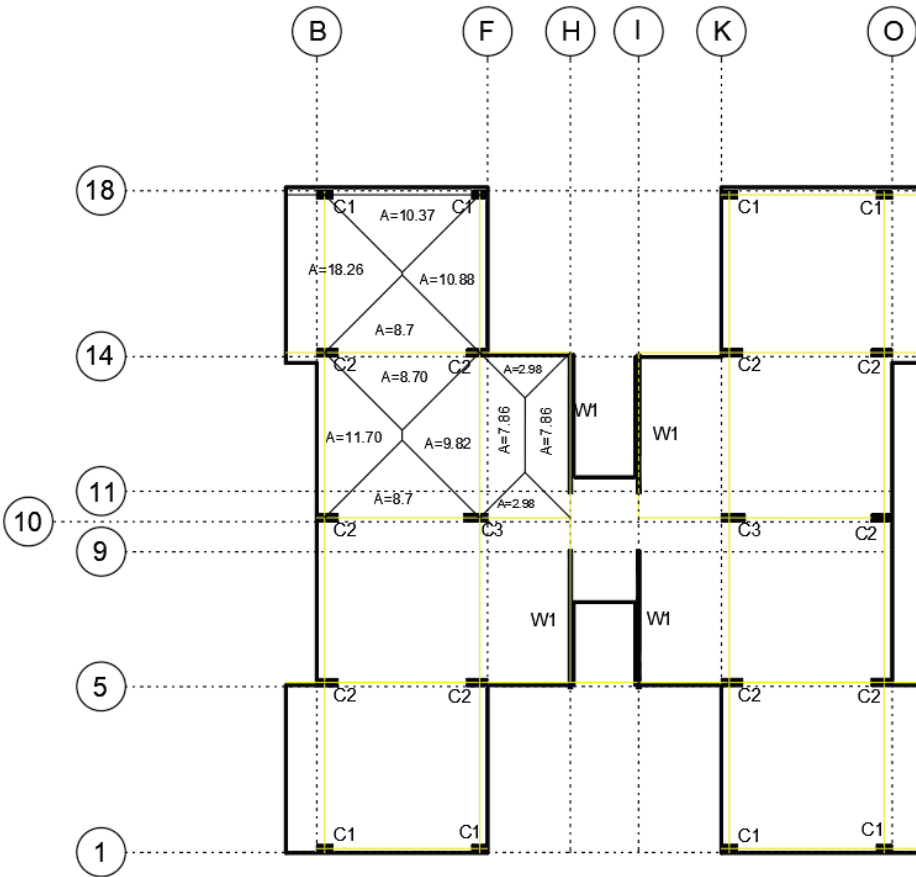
Column tributary areas shown for the northwest corner of the symmetric plan.
